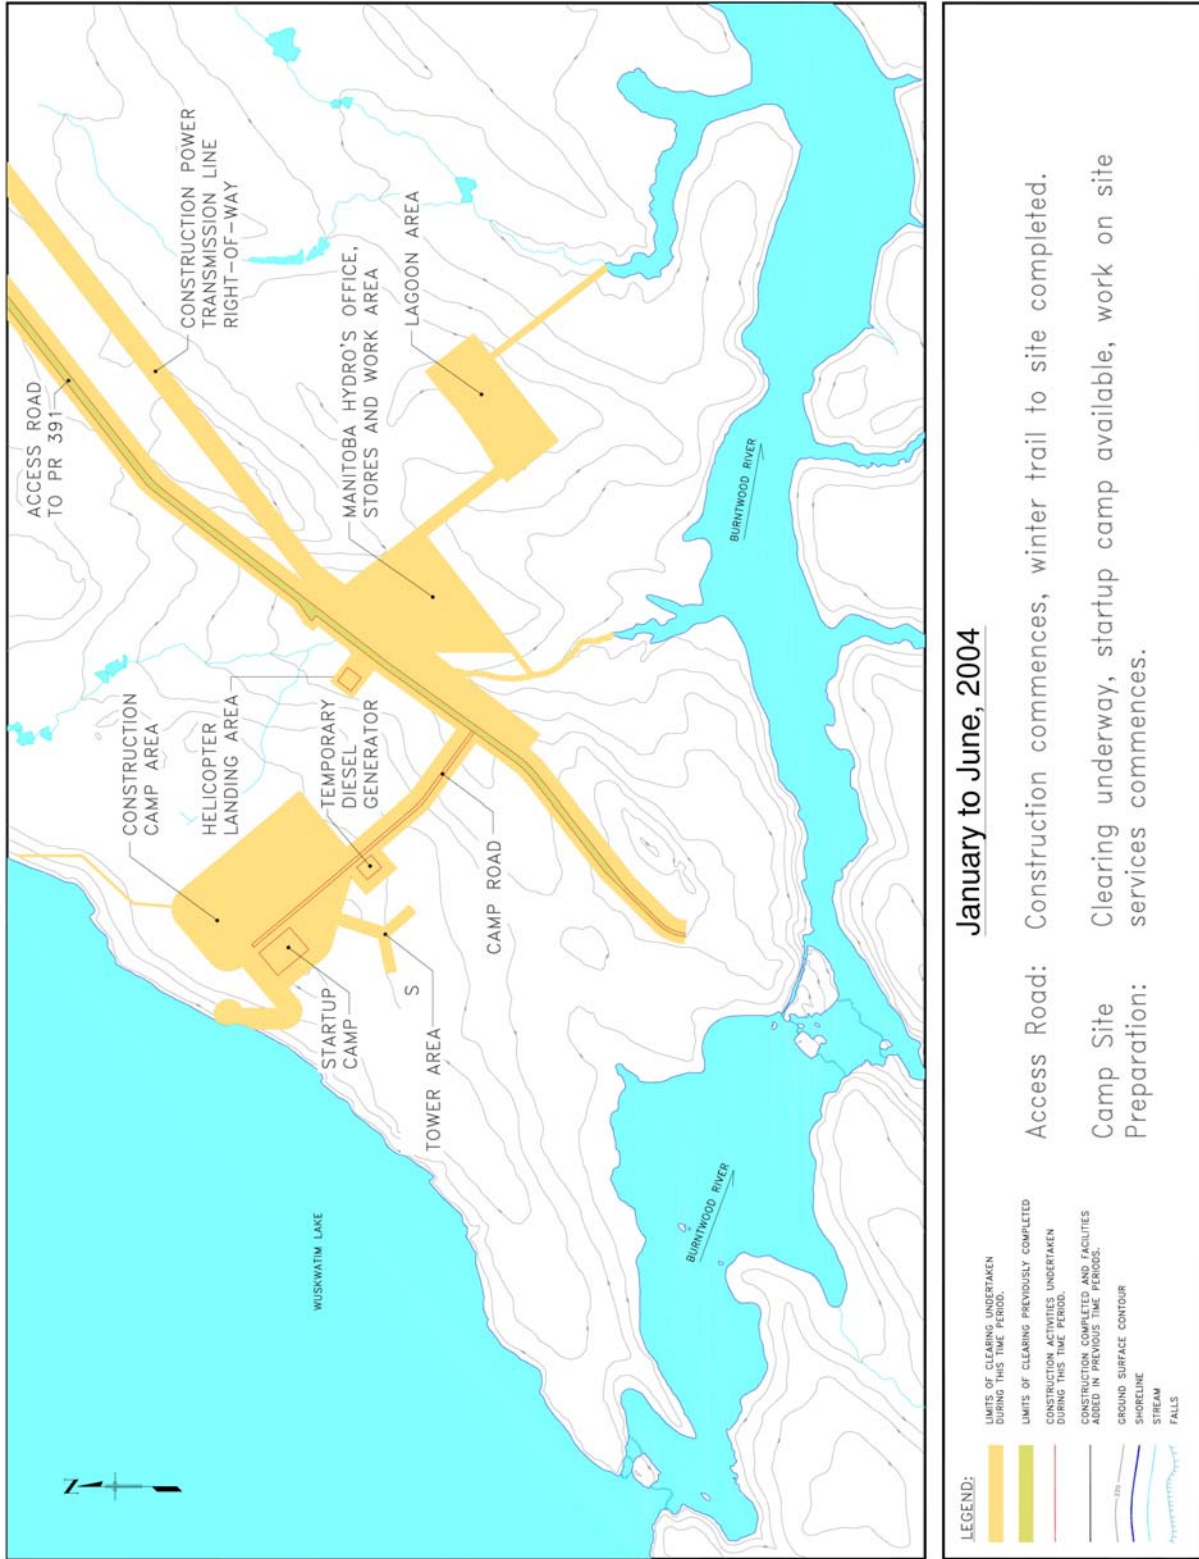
Proposed Construction Activities - January to June 2004
